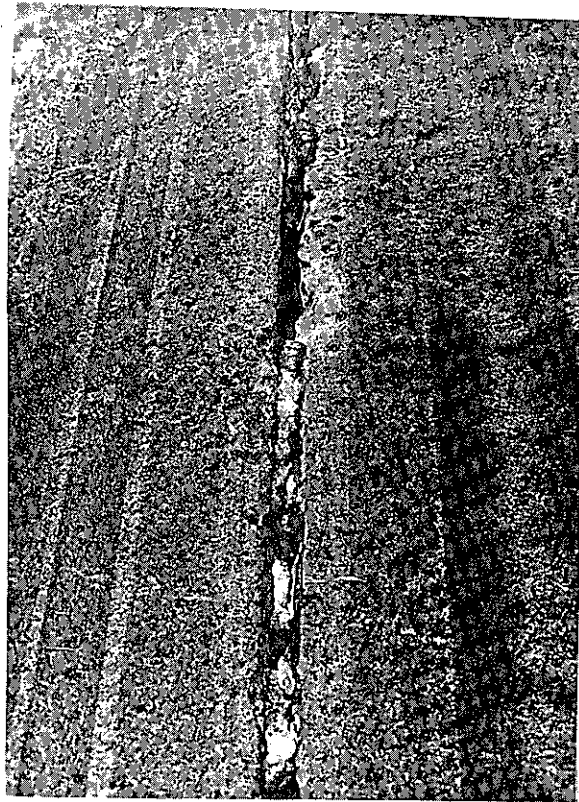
Main runway; open cross joint with some spalling.
